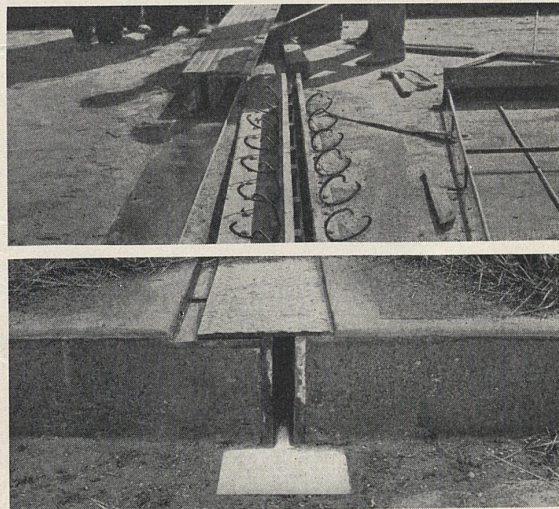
TYPE I JOINT BEING PLACED IN POSITION ON THE SUBGRADE (UPPER), AND APPEARANCE OF JOINT AFTER CONSTRUCTION OF PAVEMENT SLABS (LOWER).
